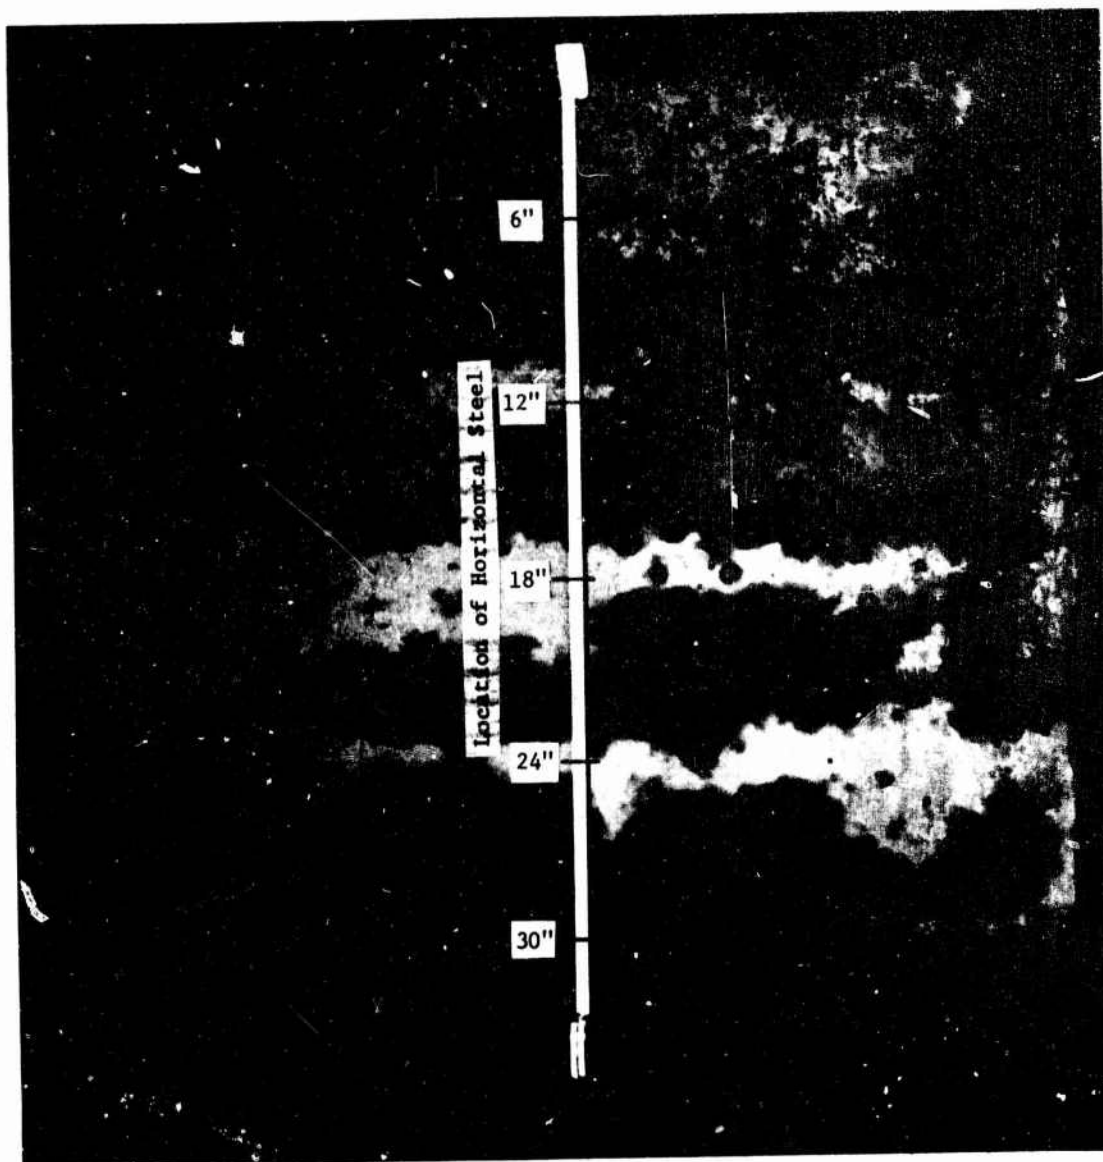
Cracks on south face of Wall 103. Horizontal crack is directly opposite a steel bar.
